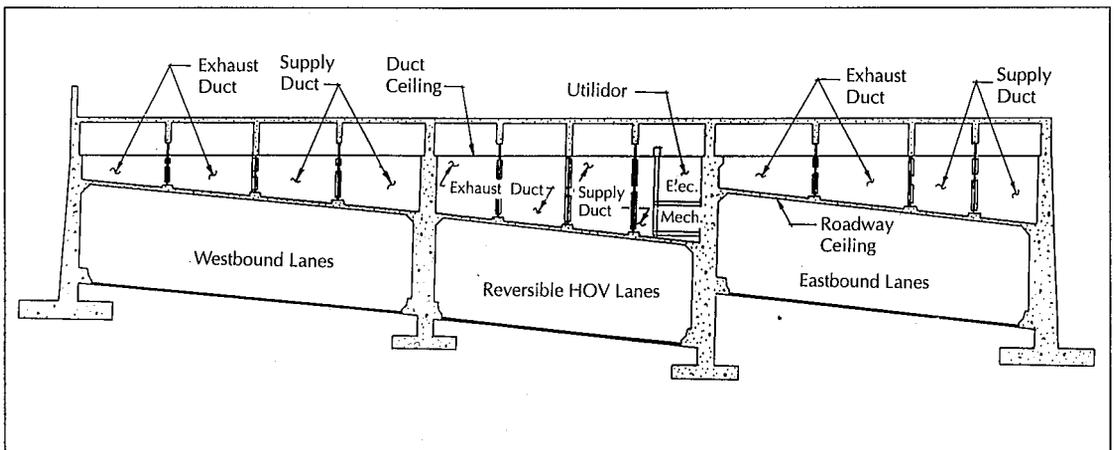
Typical section of the First Hill Mercer Island tunnel.
